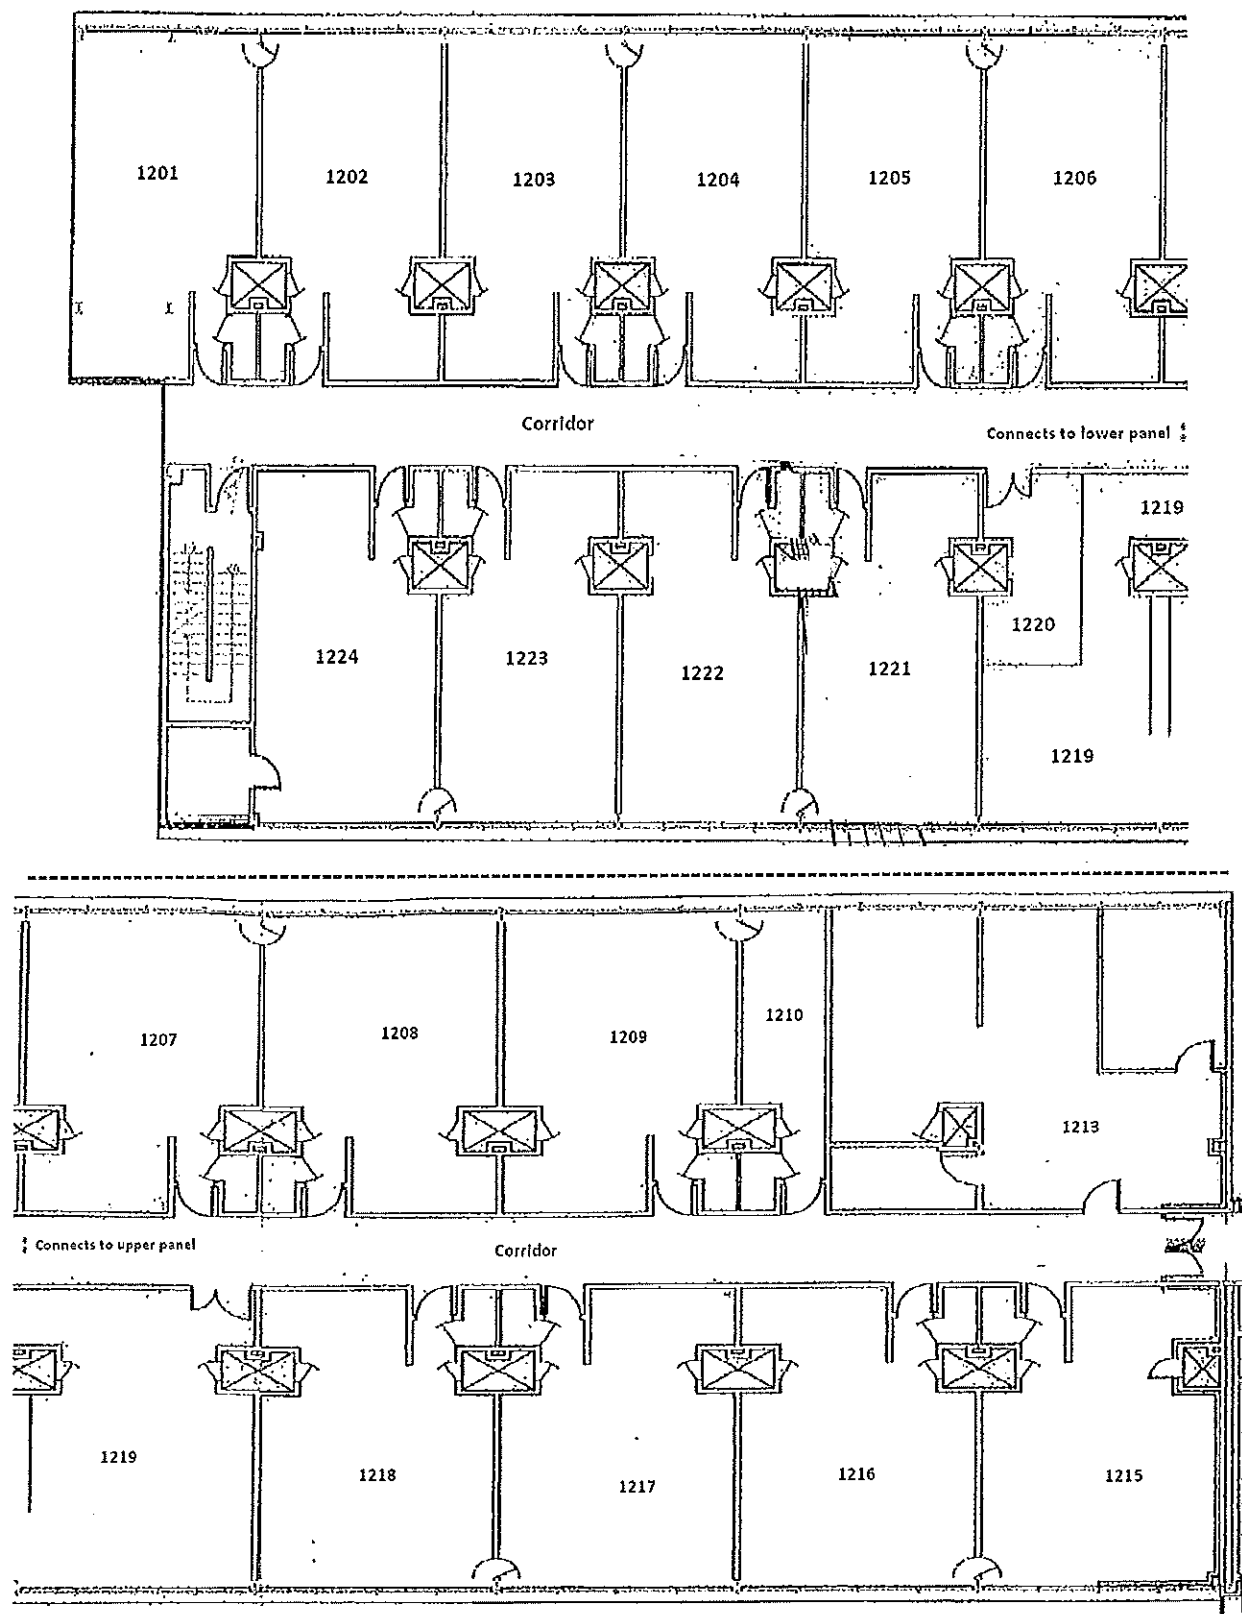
A floor plan of the Chemtura Middlebury Laboratory wing.
